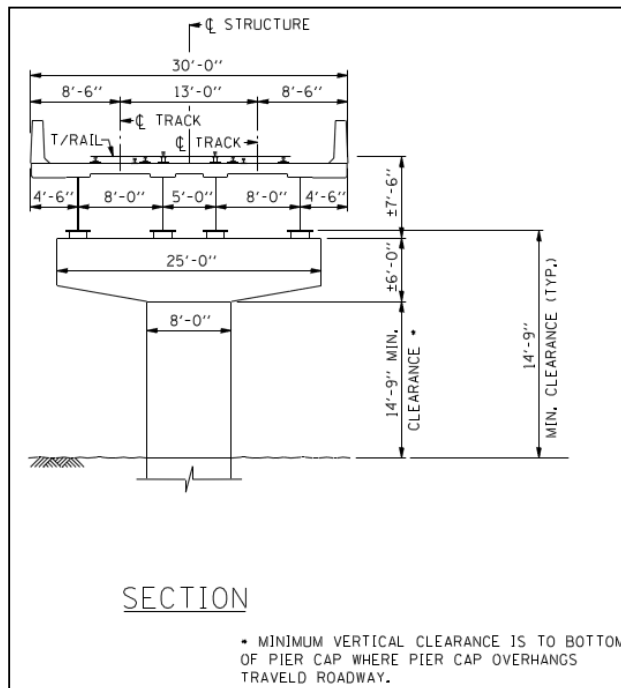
UPRR Rail Alternative ROW Option Typical Cross Section
